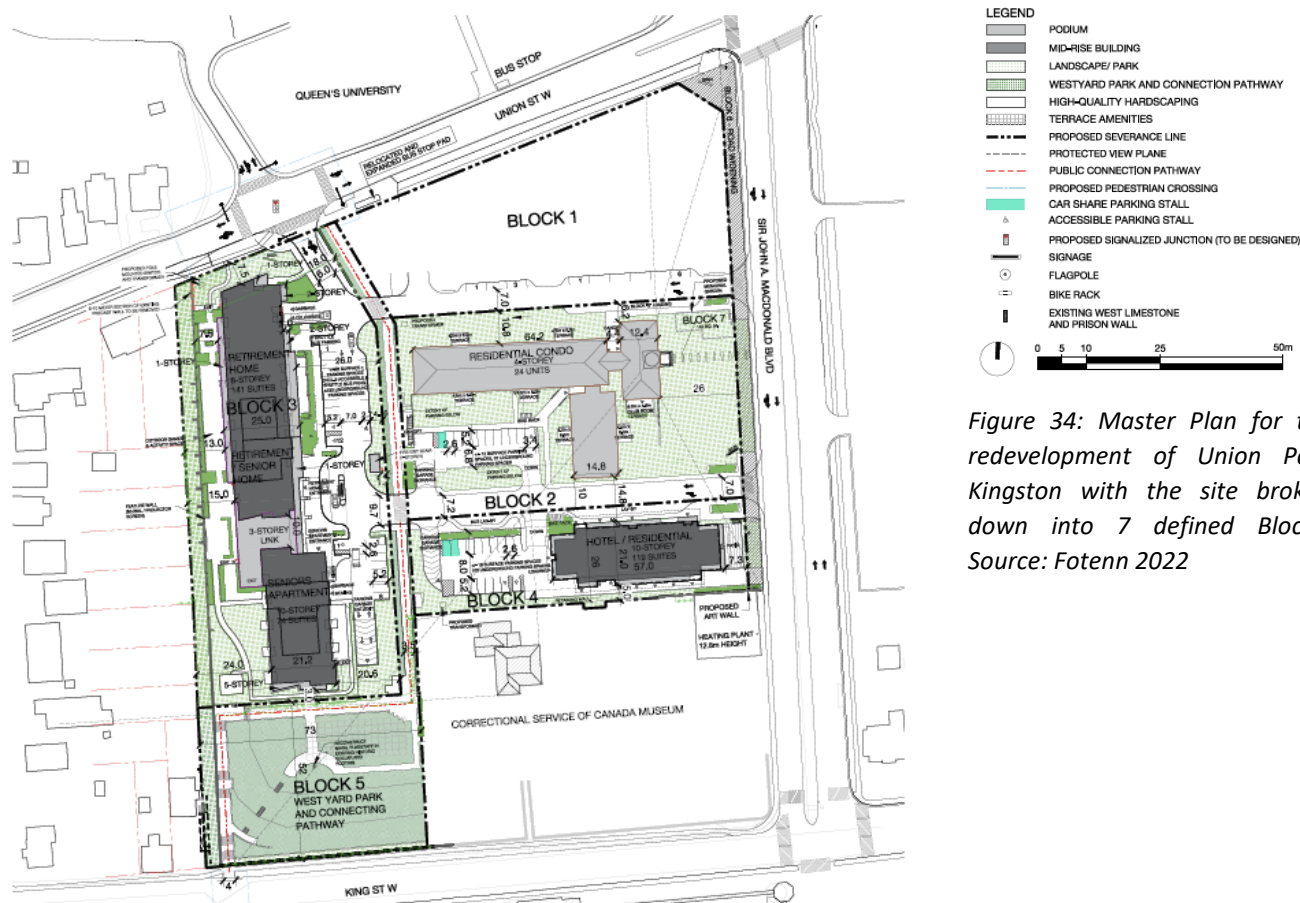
Master Plan for the redevelopment of Union Park Kingston with the site broken down into 7 defined Blocks.
